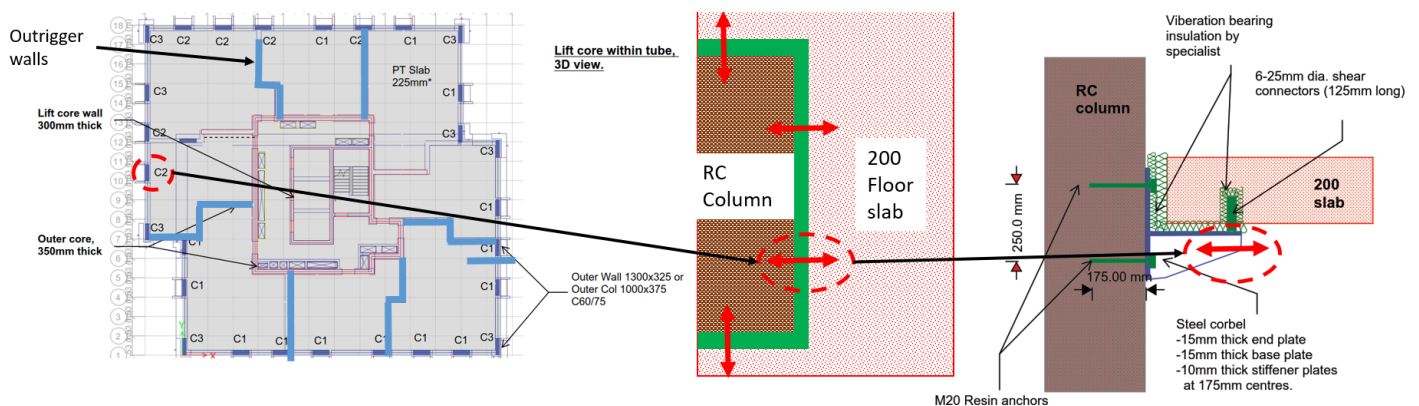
From left, 7a: typical plan of a tall building with the core in the centre and the columns around the outer perimeter, 7b: indicative requirements of the floor slabs providing restraint to the column which would have to be replicated if the column were isolated from the floor slab, 7c: indicative example of a way of achieving the restraint outlined in 7b.
